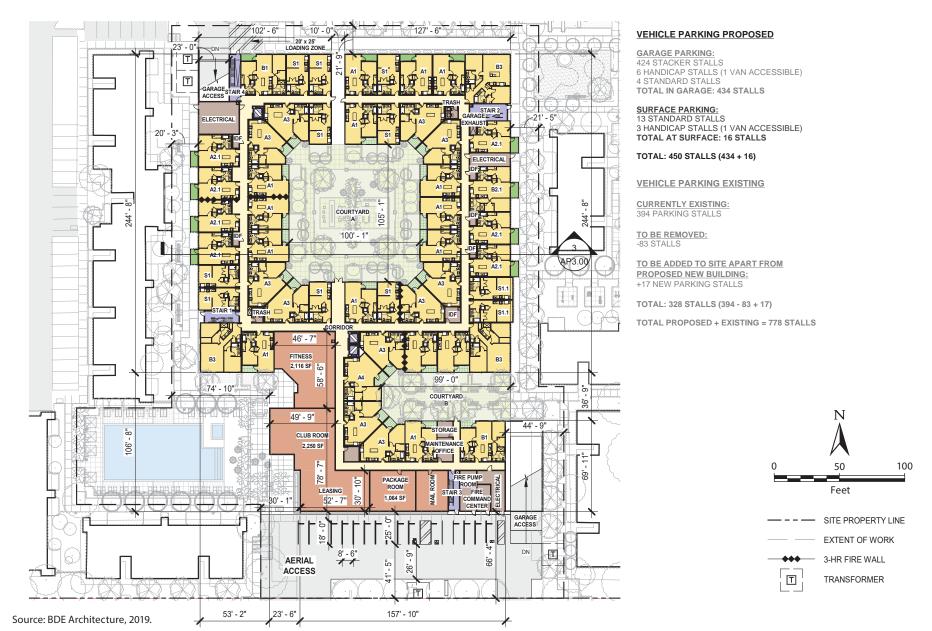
Proposed Level 1 Floor Plan Laguna Clara II Project
